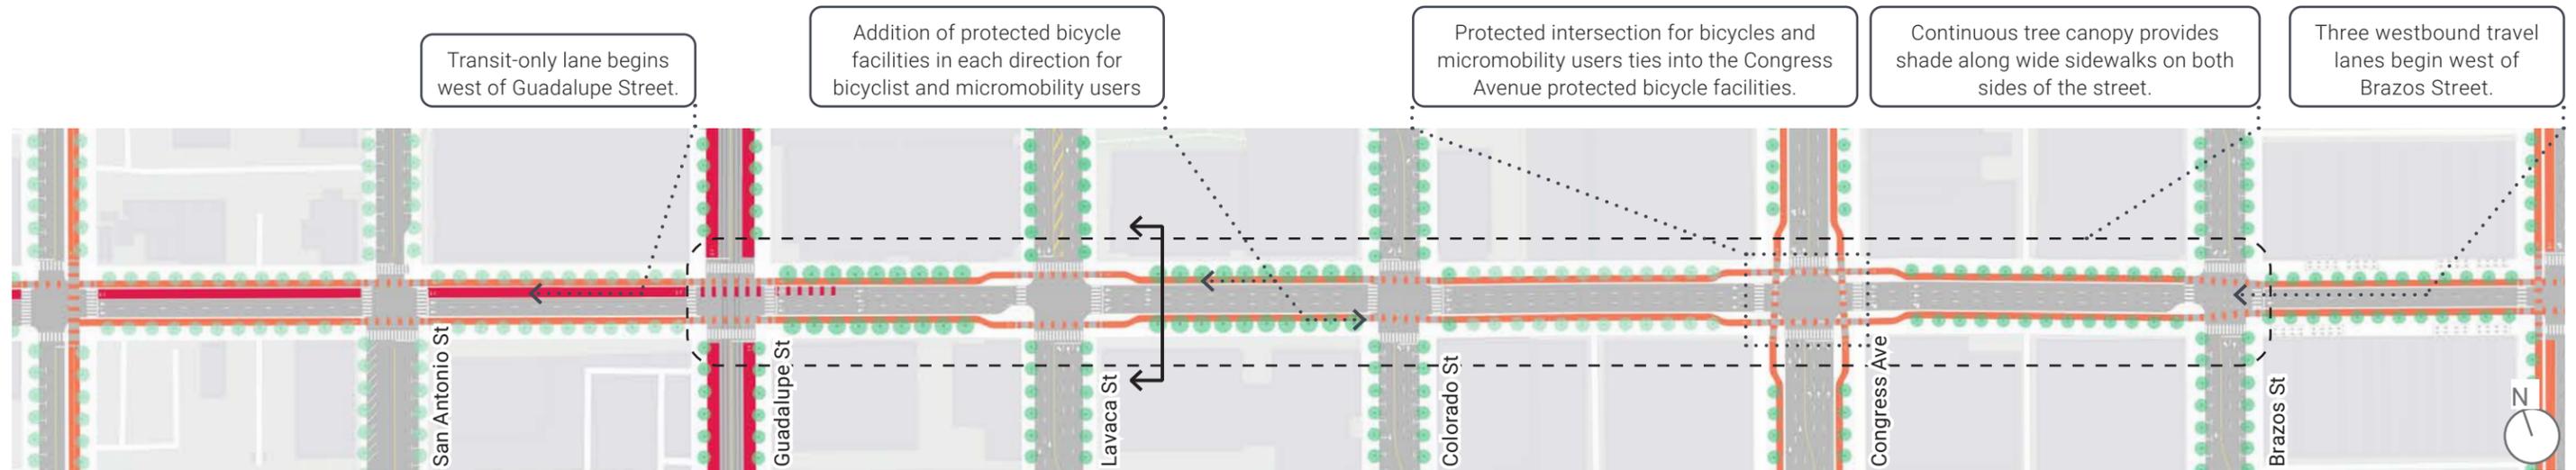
Sixth Street schematic Brazos Street to Guadalupe Street
